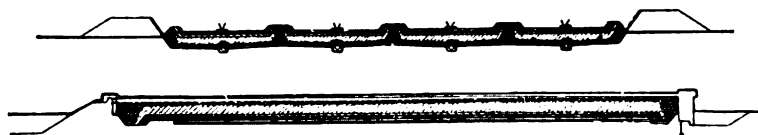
Large Hamburg Filters. Cross Section and Longitudinal Section.
